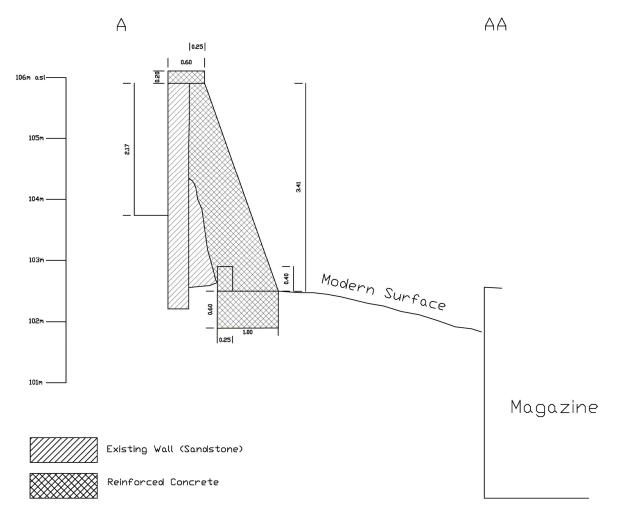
Area 2: Section through the construction (for exact location see Fig. 44).
